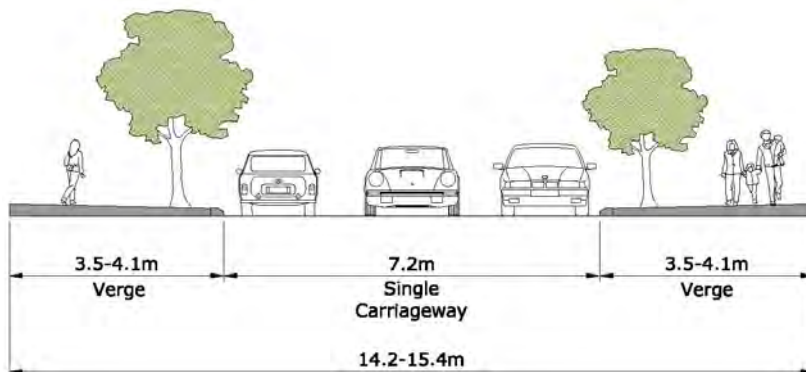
INDICATIVE CROSS-SECTION FOR RESIDENTIAL STREETS (INFORMAL PARKING)
